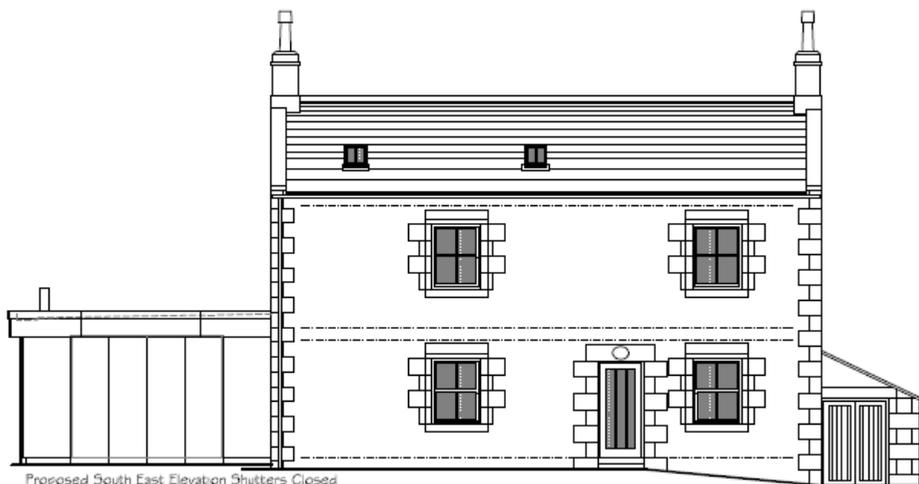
Front elevation of Lowtown incorporating proposed extension
